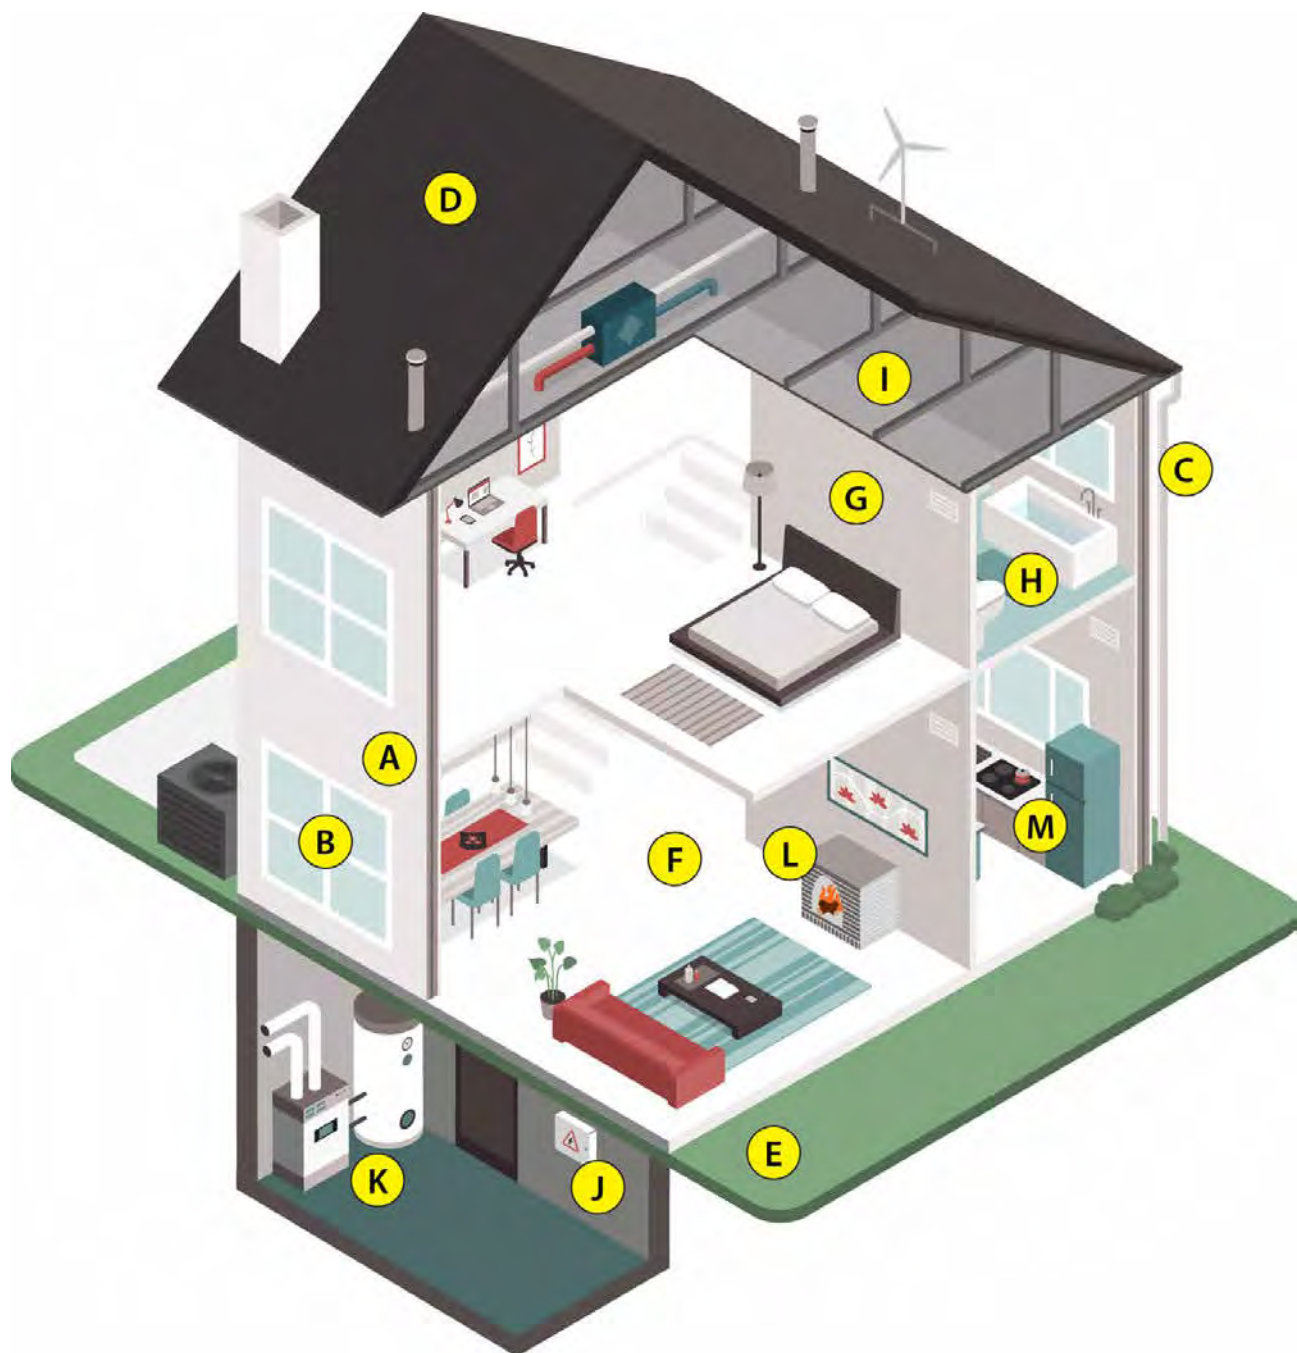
Residential building – where asbestos might be found (non-exhaustive)A: Exterior walls
